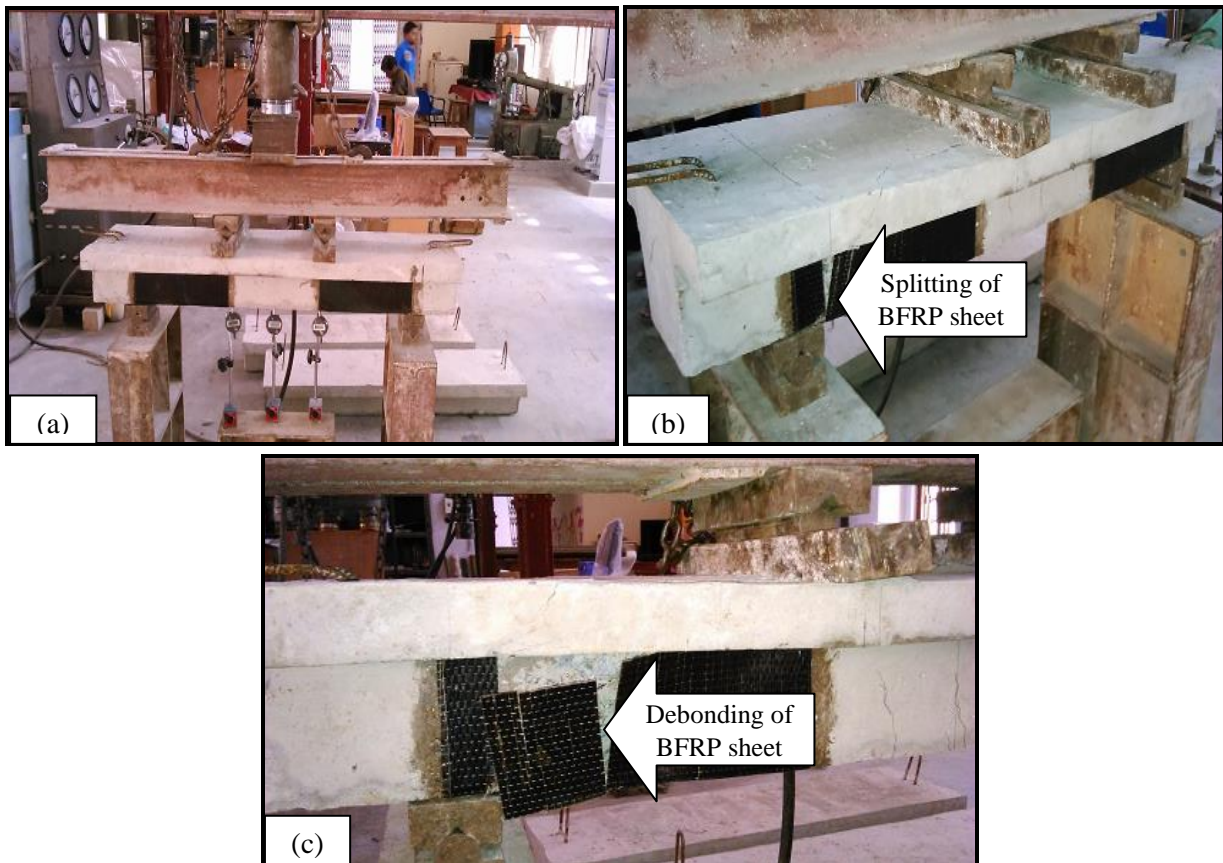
(a) Experimental Setup of beam SB5 under four-point loading system, (b) Splitting of BFRP sheet started, (c) Ultimate failure of beam SB5 by debonding of BFRP sheet followed by diagonal shear crack
